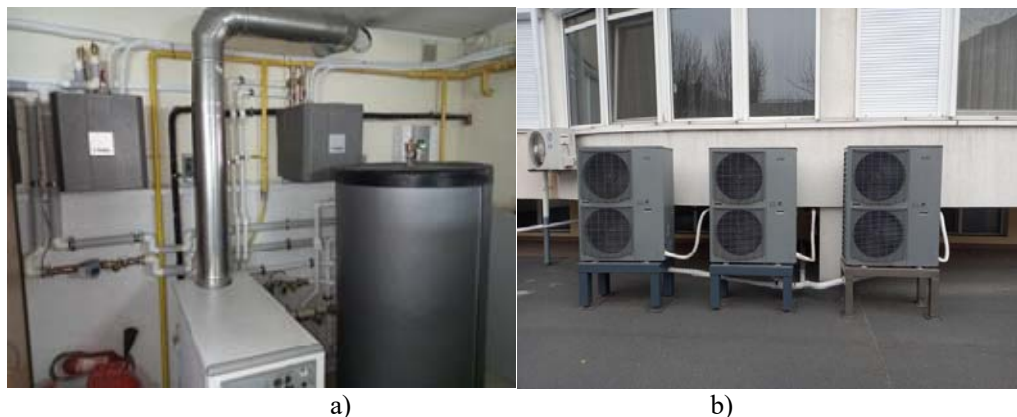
a) NIBE heat pumps connected to the existing heating plant;
